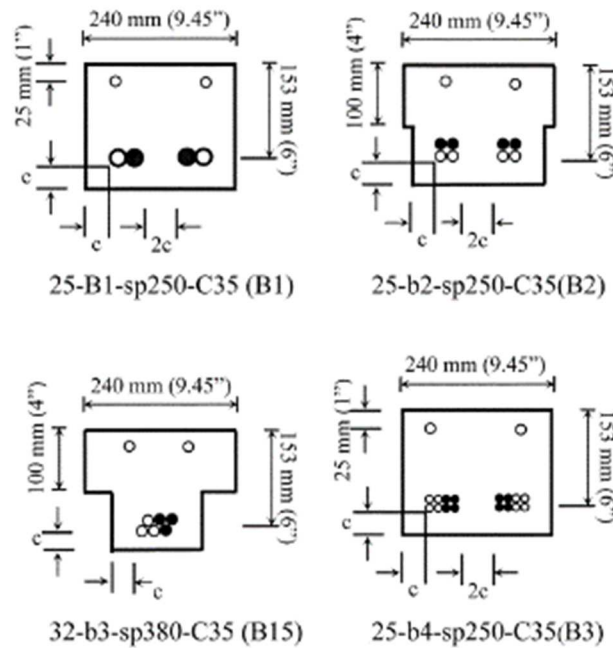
Cross-sectional detail of specimens tested by (Bashandy, 2009)
